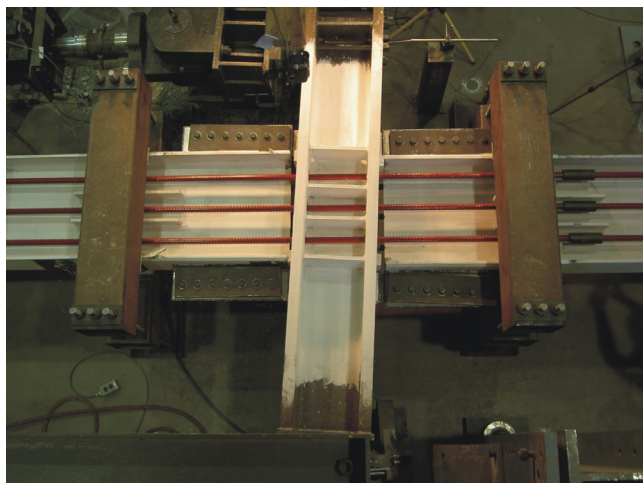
Undamaged post-tensioned moment-resisting frame at 4% drift (photograph courtesy of Professor C. Christopoulos).
